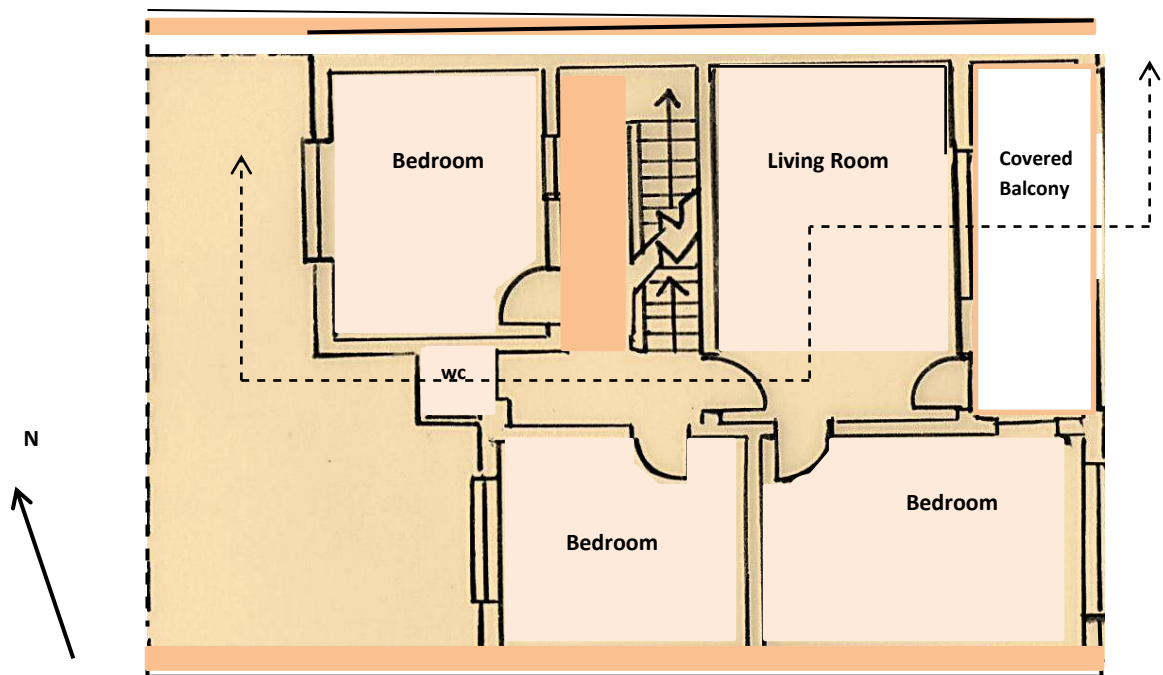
First floor level plan of the modern house No. 7. Scale: 1:100
